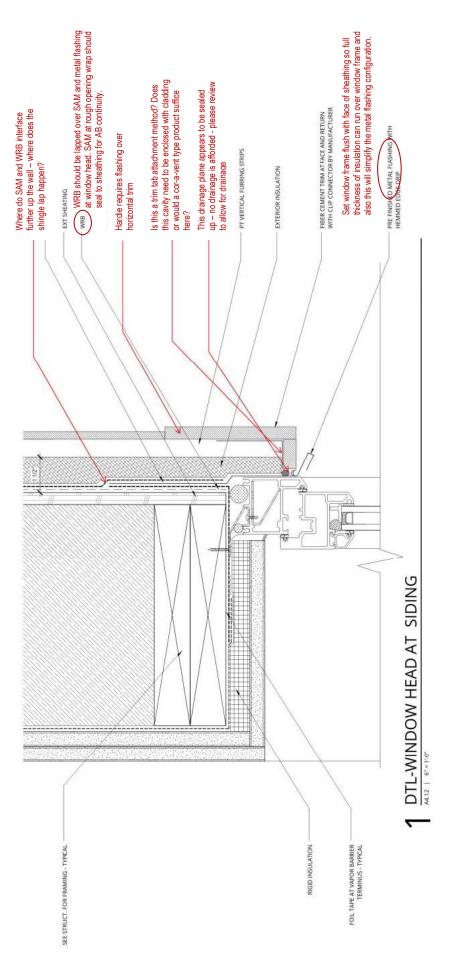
Architect's design detail of typical window head condition (at design development stage). Notes in red are the contractor's DD review comments.
